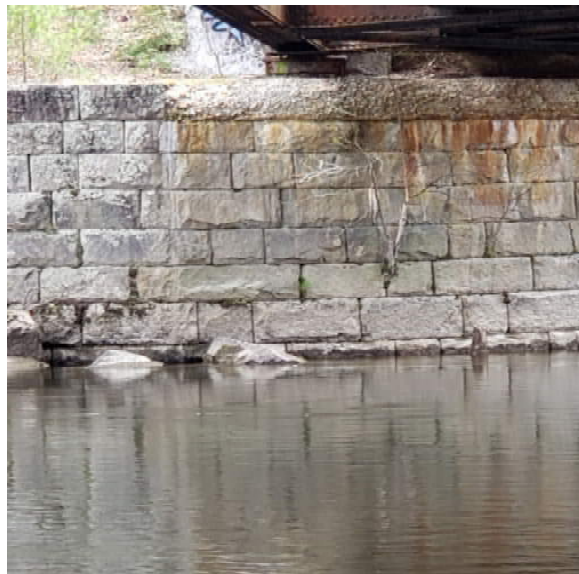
Saco River Bridge – Stone Abutment with Concrete Abutment Seat
